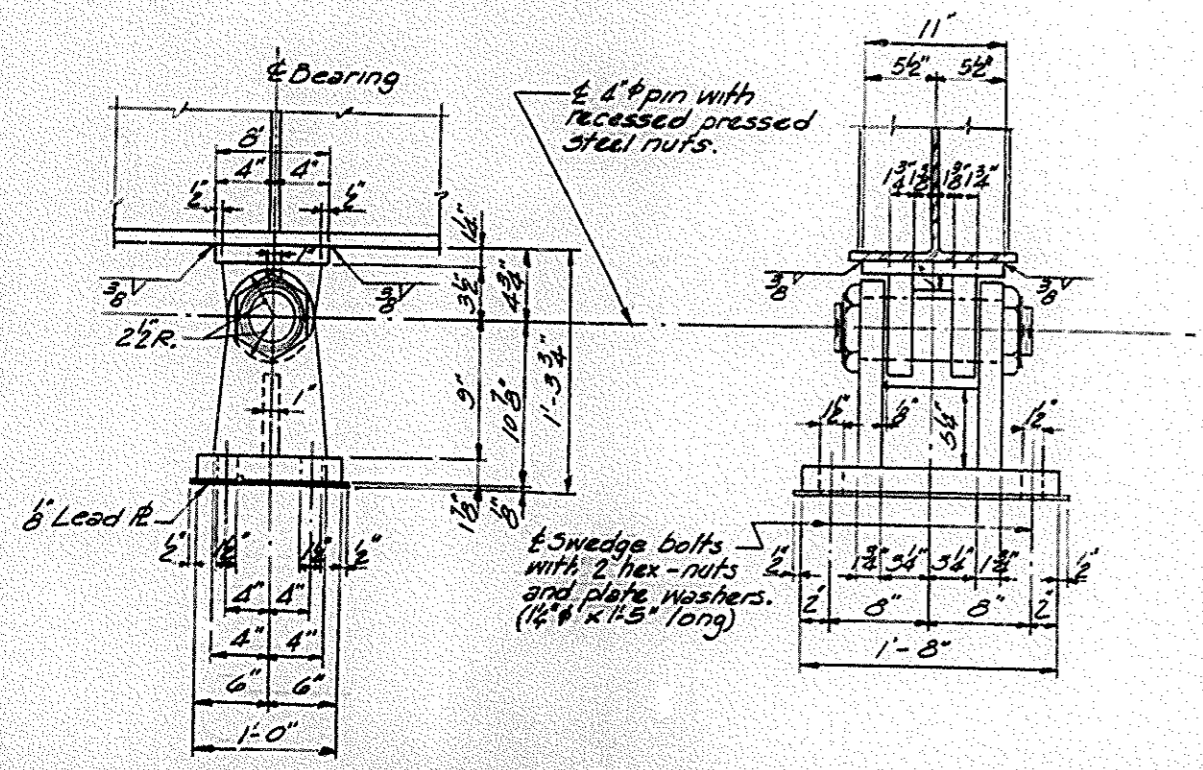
DETAIL OF EXPANSION ROCKER AT ABUTMENTS
